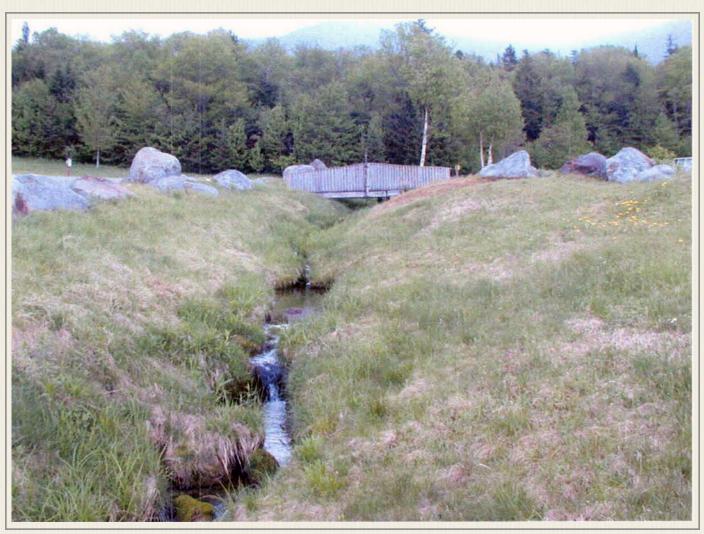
View of stream north of culvert looking towards foot bridge and base road. Rocks on either side of photo are edge of gravel parking lot.
